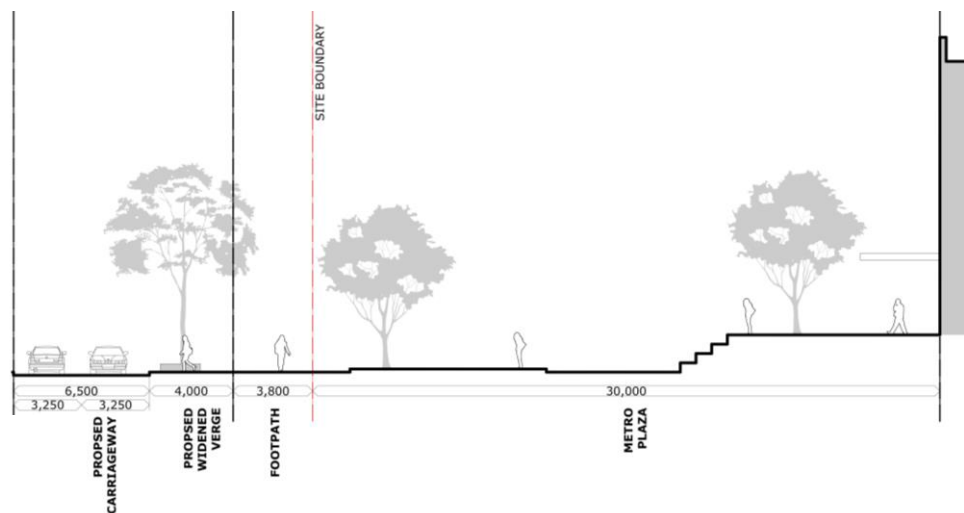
Section D - D – Local Street Typical Section – Cope Street (Cope Street Plaza)
